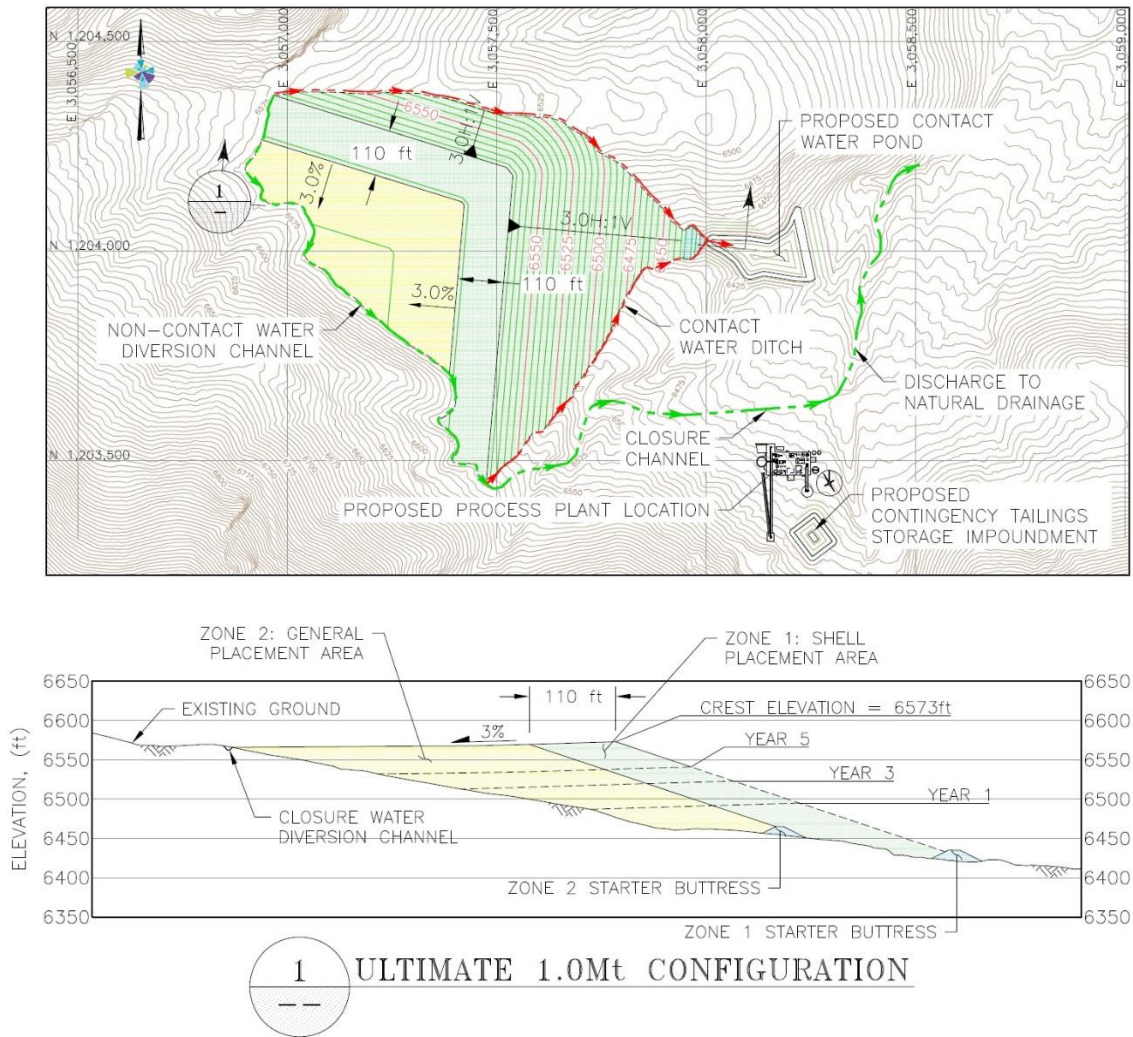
Typical Plan and Section of the Ultimate (1.0 million ton) FTSF
